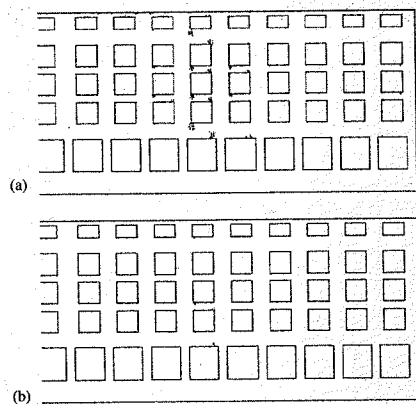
Crack pattern (a) and fully open cracks (b) for the independent façade.
